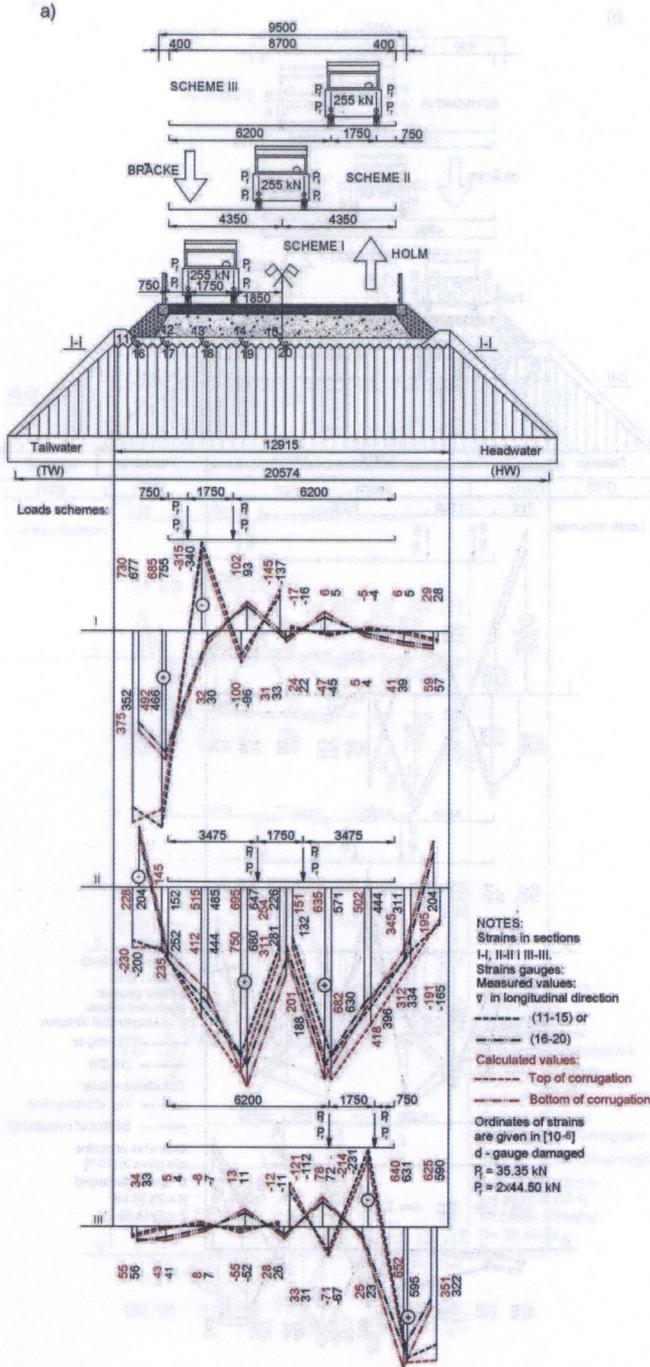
Graphs of maximum strains in selected points (gauges no. 1-20 in transverse direction) of steel shell structure in cross-sections of the span: a) I-I.
